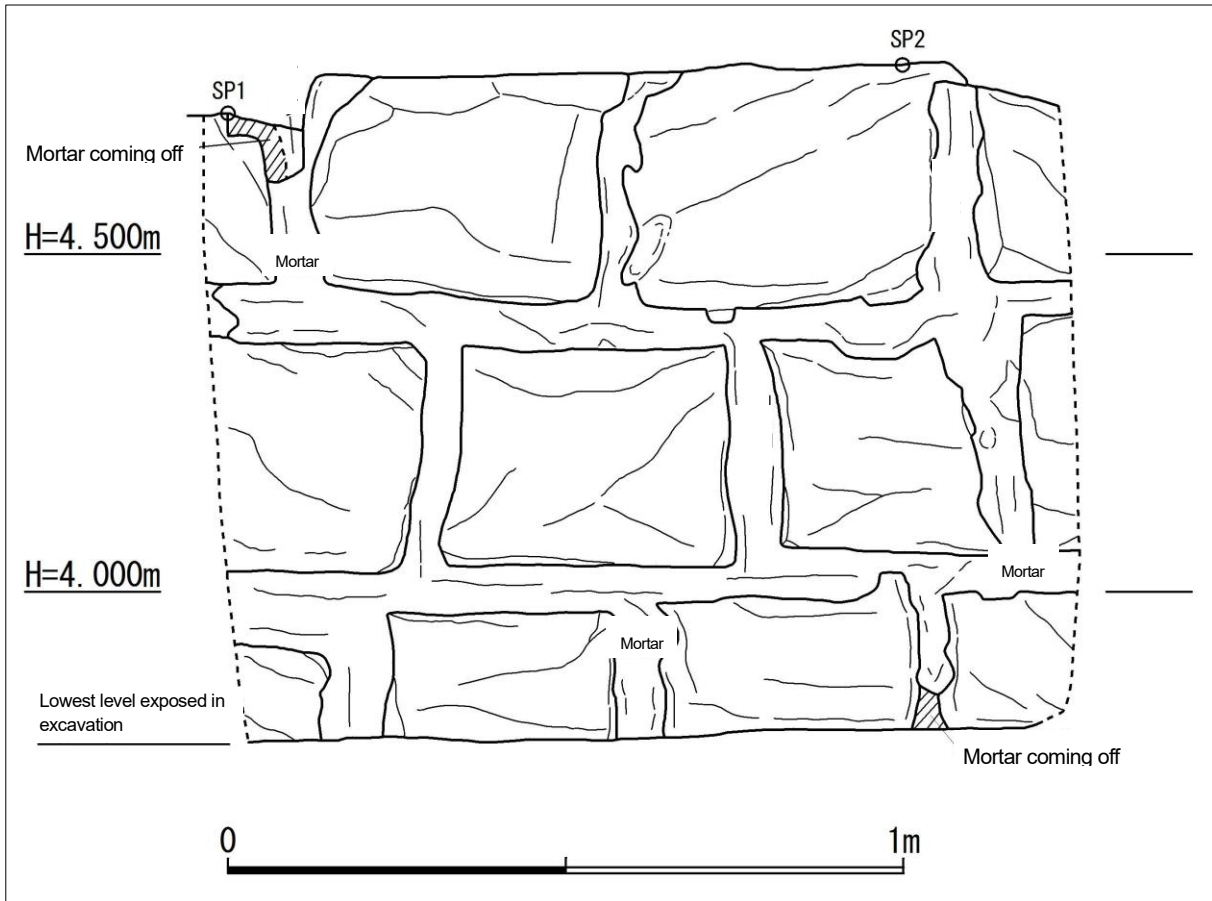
Elevation plan of former seawall revetment (Trench No. 2)
